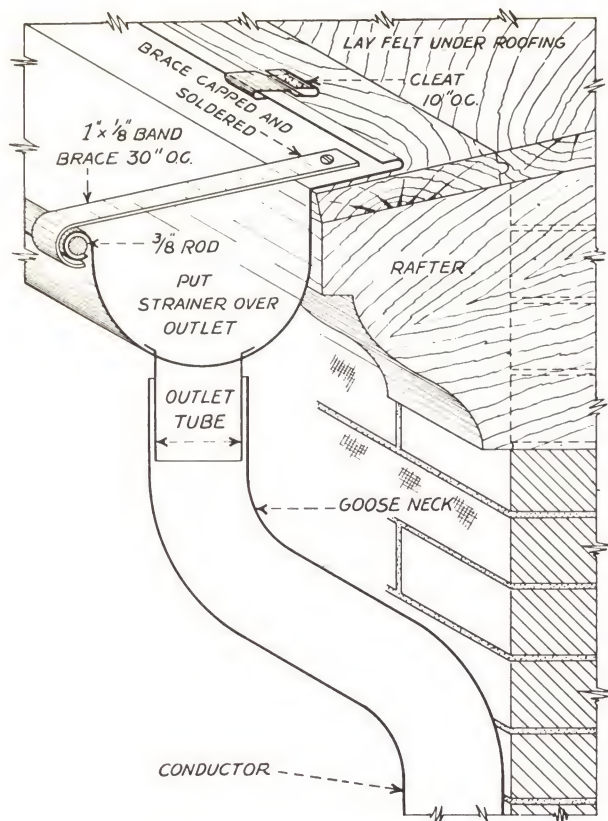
HANGING GUTTER WHICH CAN BE USED IN CONNECTION WITH FLAT SEAM, STANDING SEAM AND BATTEN ROOFING SCALE 2"=1'-0"
